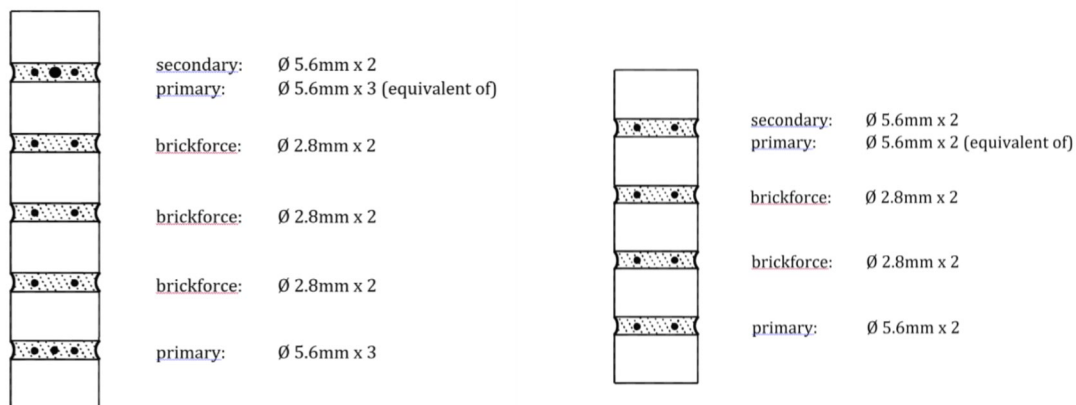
Bed joint reinforcement above openings for wall W1 (left) and W2 (right)
